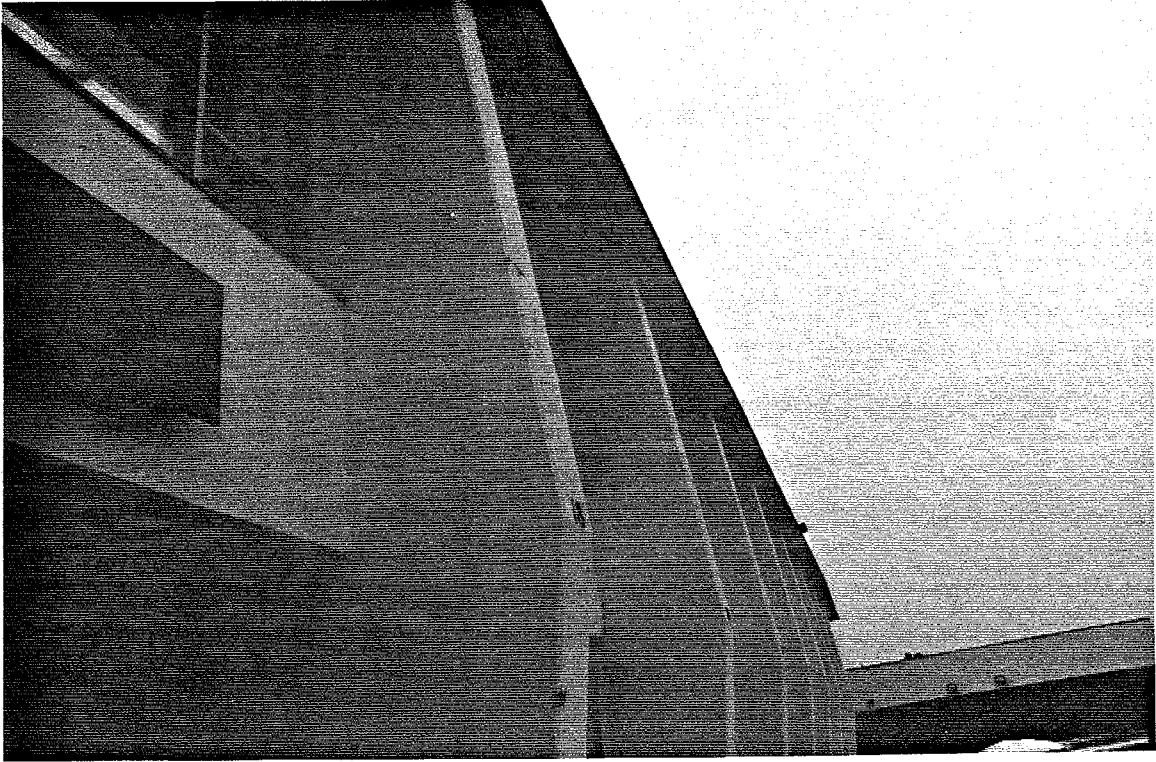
Horizontal cracking in exterior columns of older wing.
